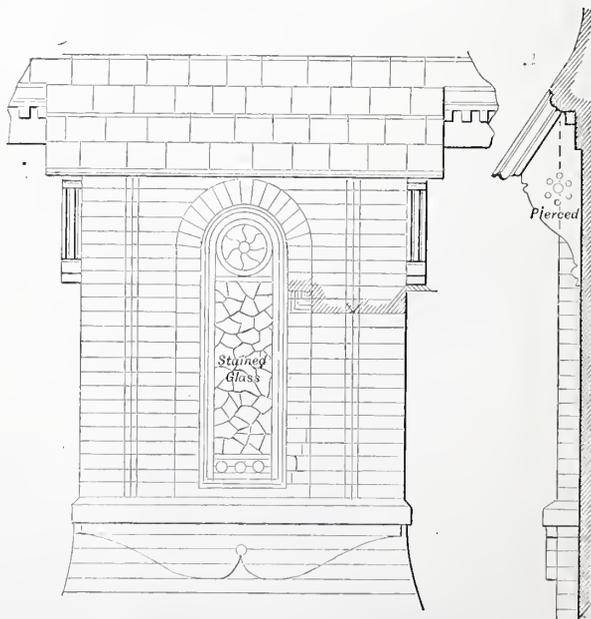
Chimney Window in Dining-Room.—Scale, 3/8 Inch to the Foot.
